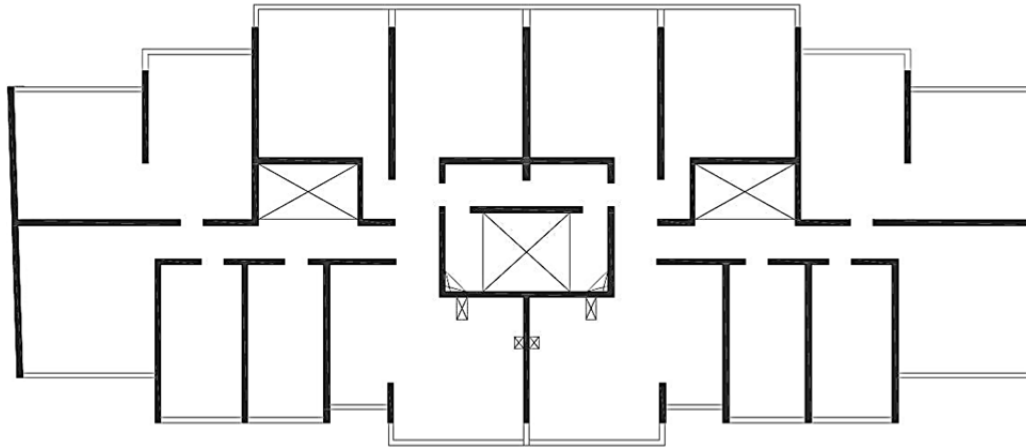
Typical floor plan of high-rise residential building in Chile (courtesy of Rene Lagos).
